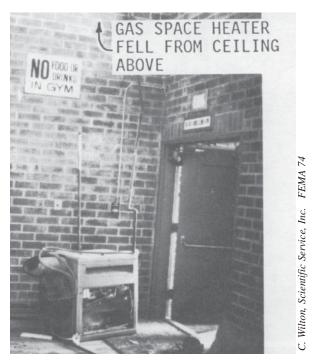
Equipment that is not well connected to ceilings above can fall and cause serious injuries.
